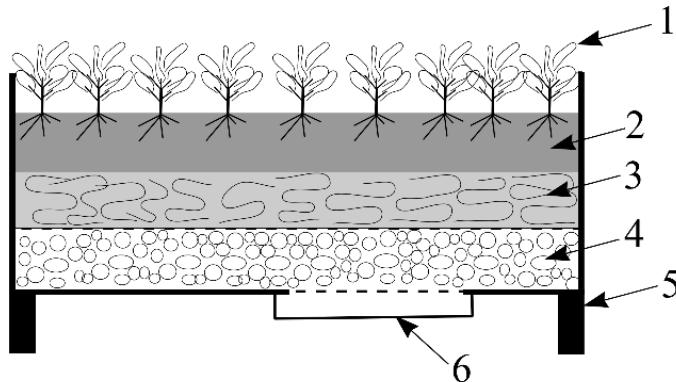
Raised garden bed: 1. – Plants; 2. - Peat layer (15 cm); 3.-Water filtering layer (10 cm); 4.- drainage layer (ceramzite, 5 cm.); 5. – Wooden bed frame; 6. – Water tank.
